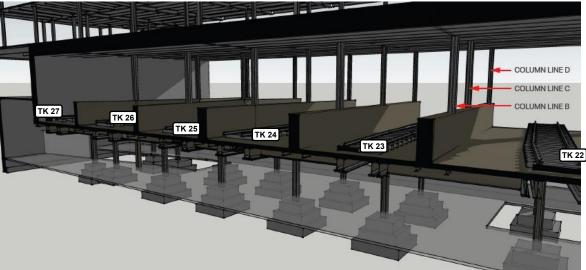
below demonstrates the start of the crash wall reconfiguration that occurs during Phase 1. That begins with strengthening the columns between existing Tracks 25 and 26. Strengthening these columns will either require bracing/reinforcing or reconstructing the columns themselves as required. Additionally, the 12' high tunnel or crash wall will be constructed here. At that time Tracks 25 through 30 will be removed from service and demolished.
